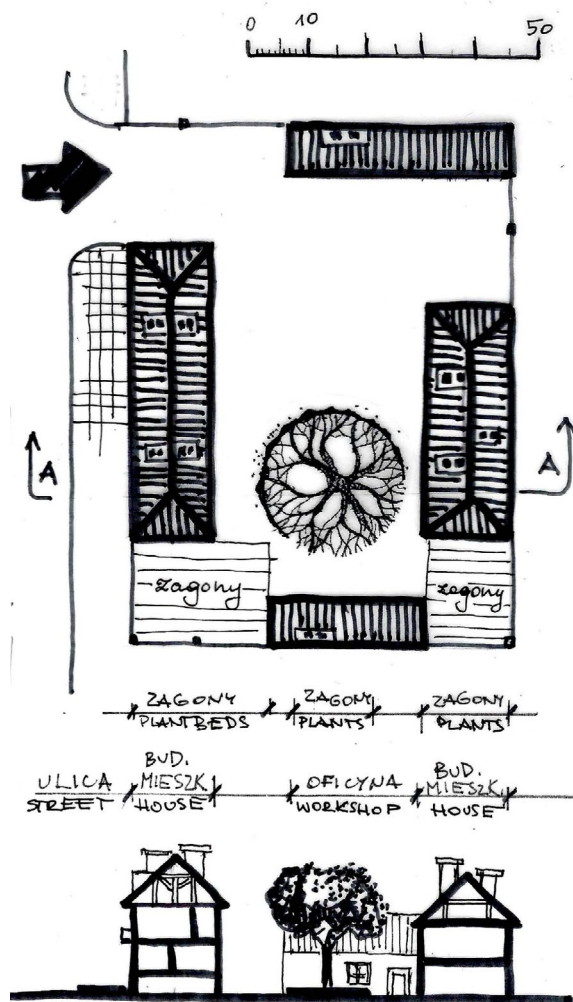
Backyard of type B (plan and cross-section) (drawing I. Zalewska-Kantek)
